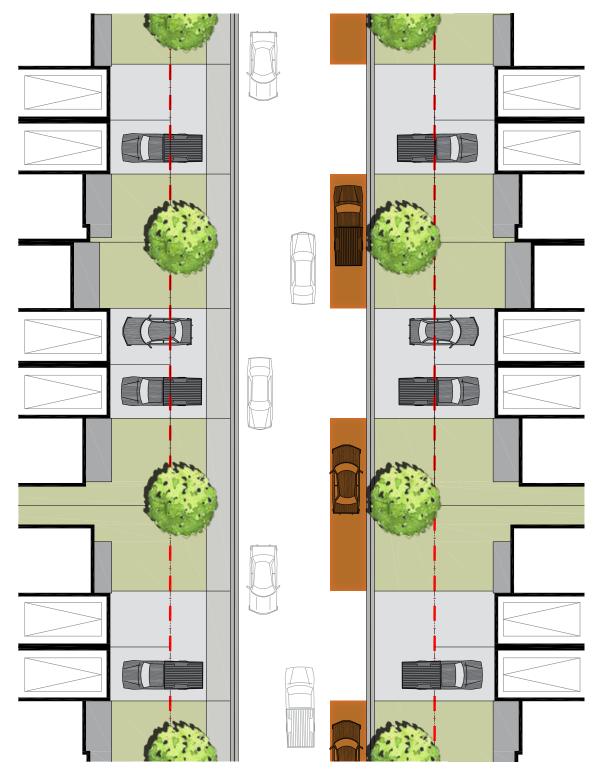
Front-Drive Townhomes Parking Demonstration on Local Road
